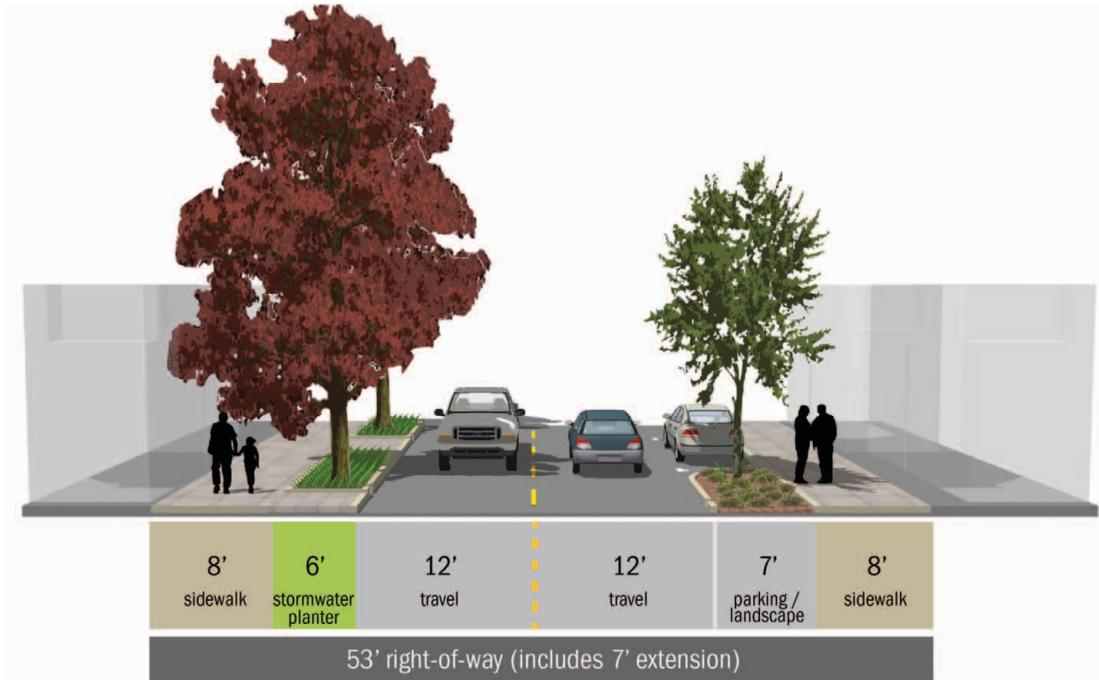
Conceptual Cross-Section for Main Street – North of Beta Street with additional right-of-way
